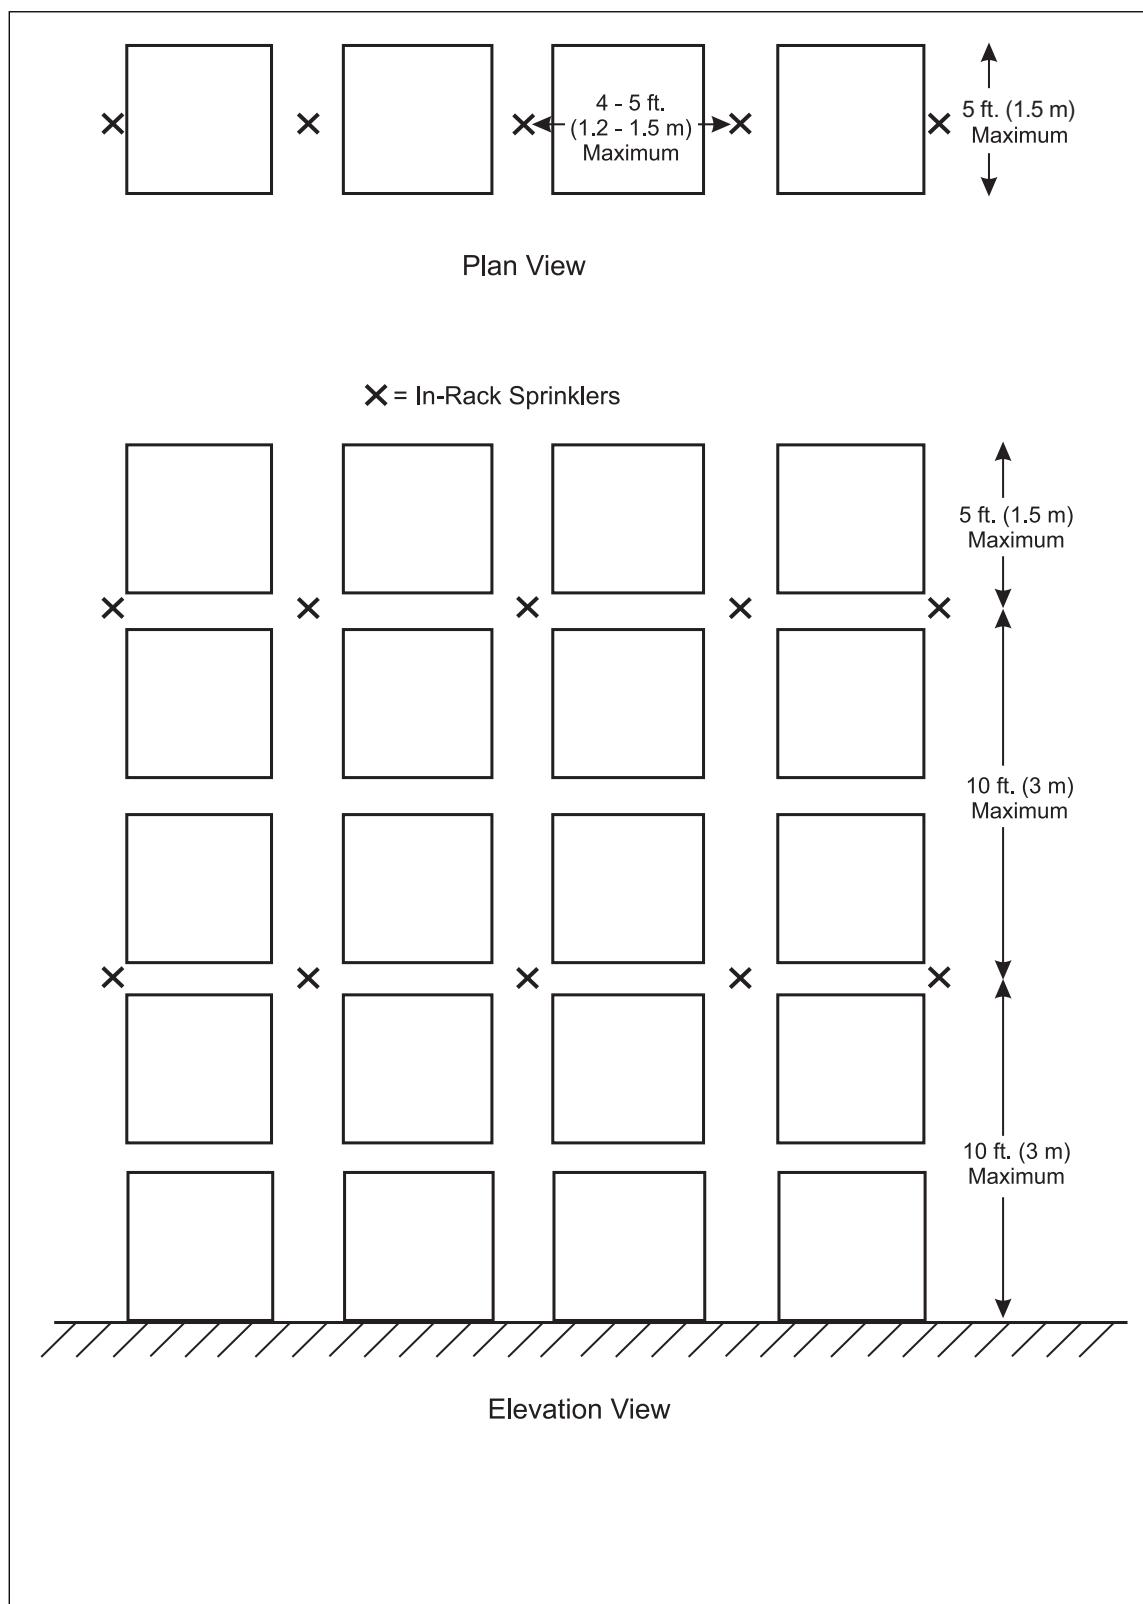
Single-row rack sprinkler layout: quick response sprinklers protection scheme
